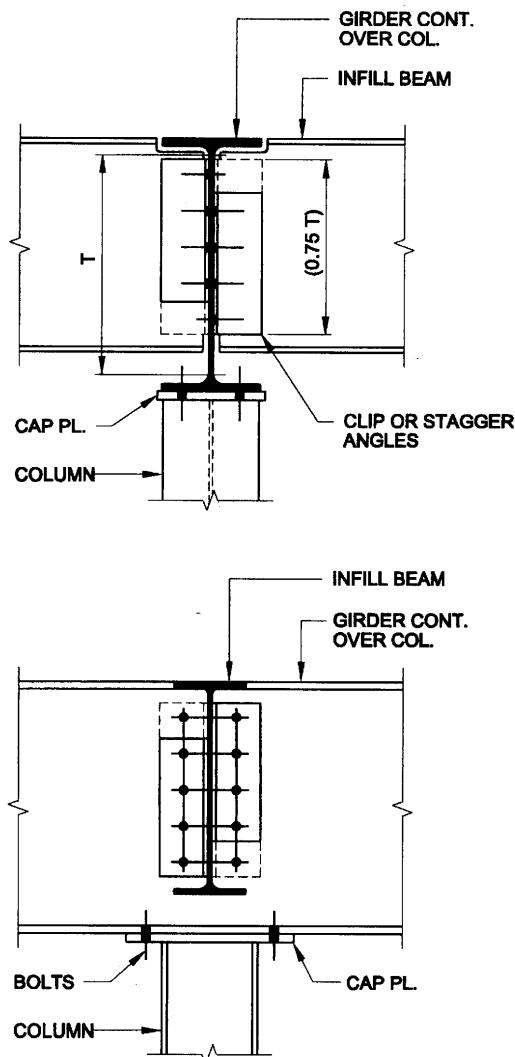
Beam framing continuously over column top, stability provided with connections of infill beams.
